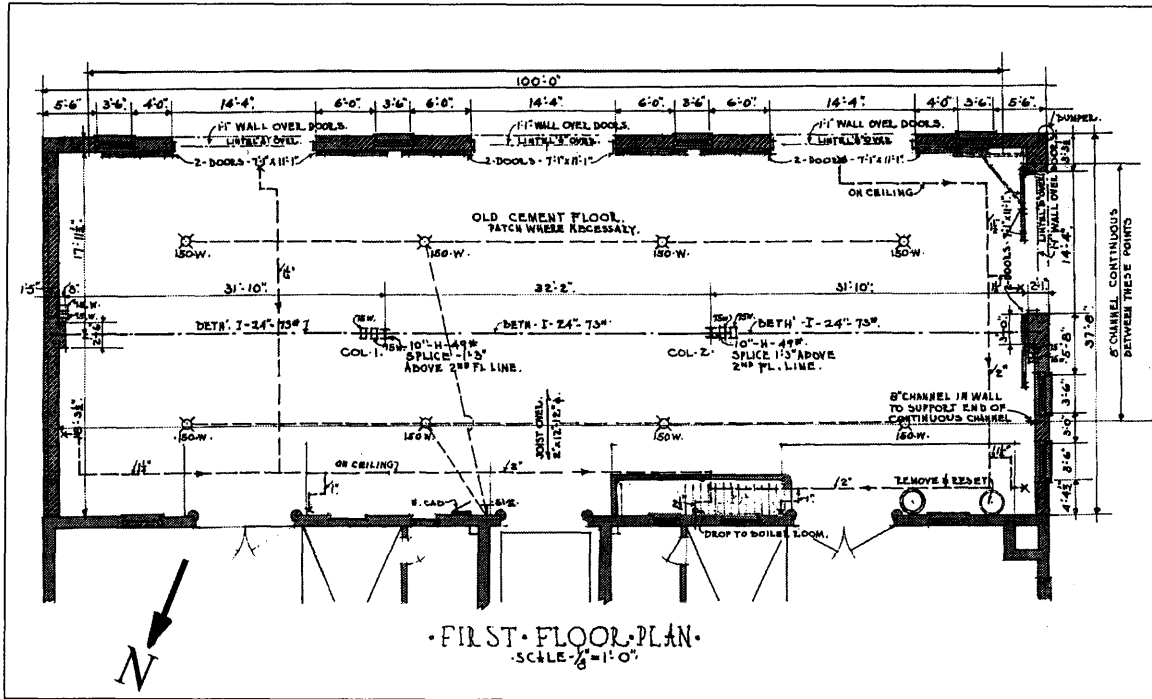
Historic addition first floor plan (Proudfoot, Bird & Rawson, architects, 1919)
